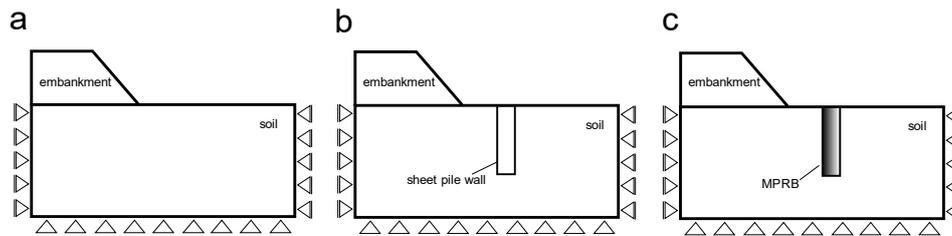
Numerical model (with the boundary conditions) of MPBR installation, where : a) in-situ state, b) sheet pile punching and excavation c) reactive material filling and removing sheet piles
